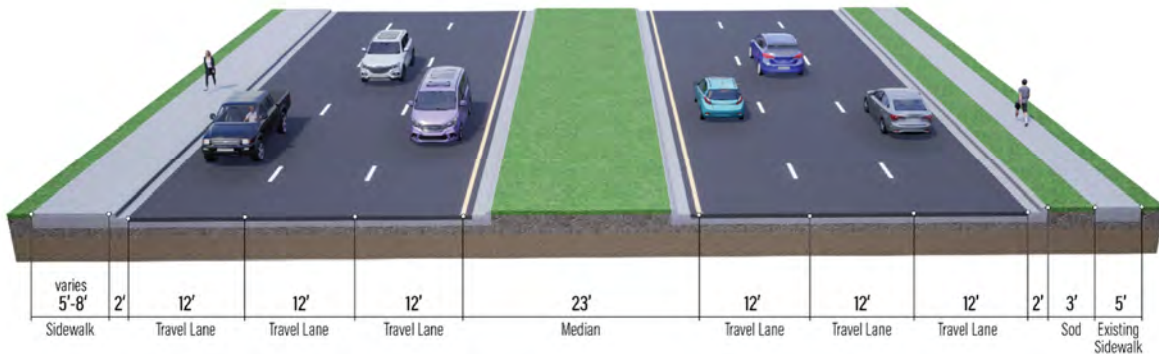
Existing Typical Section 1 - US 41 from University Parkway to North of General Spatz Boulevard
